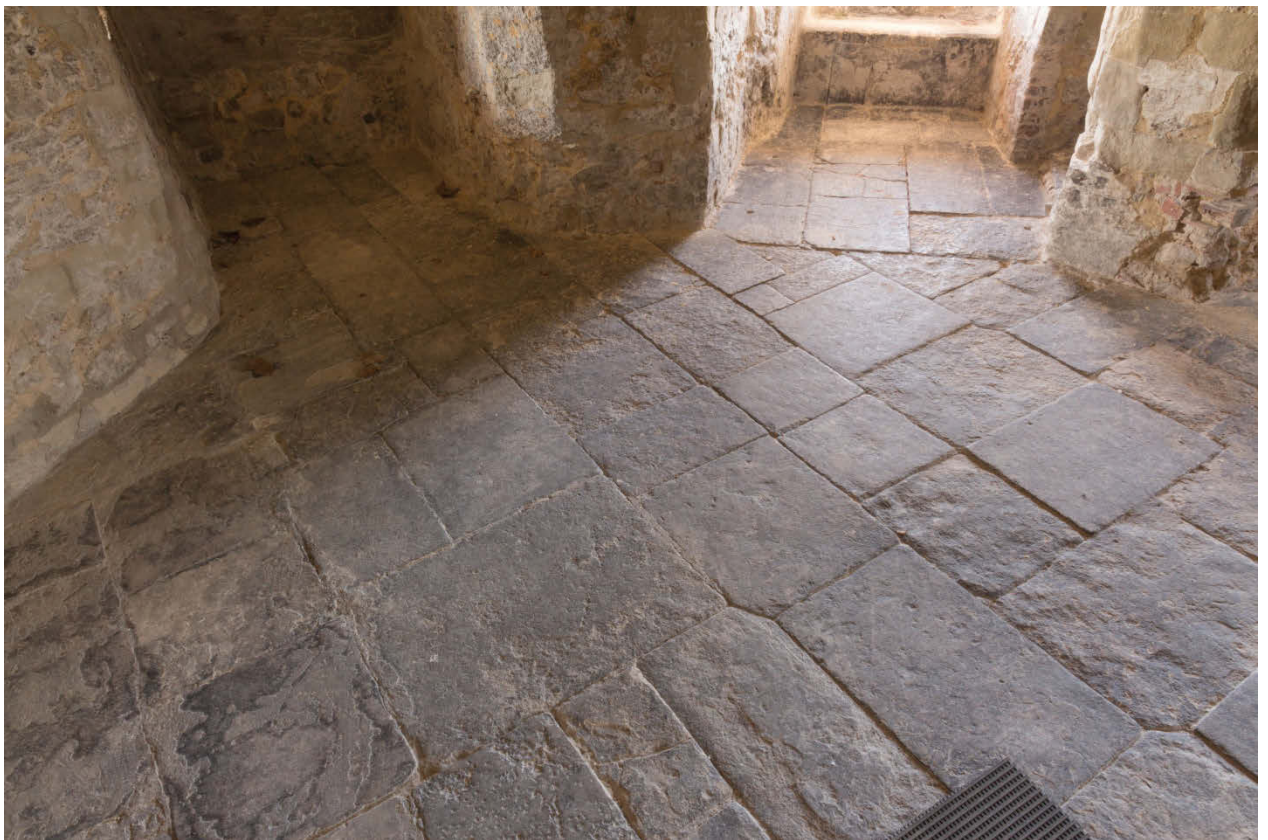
Flagstone floor in the Main Chamber in the upper part of the Bell Tower, looking south-west
